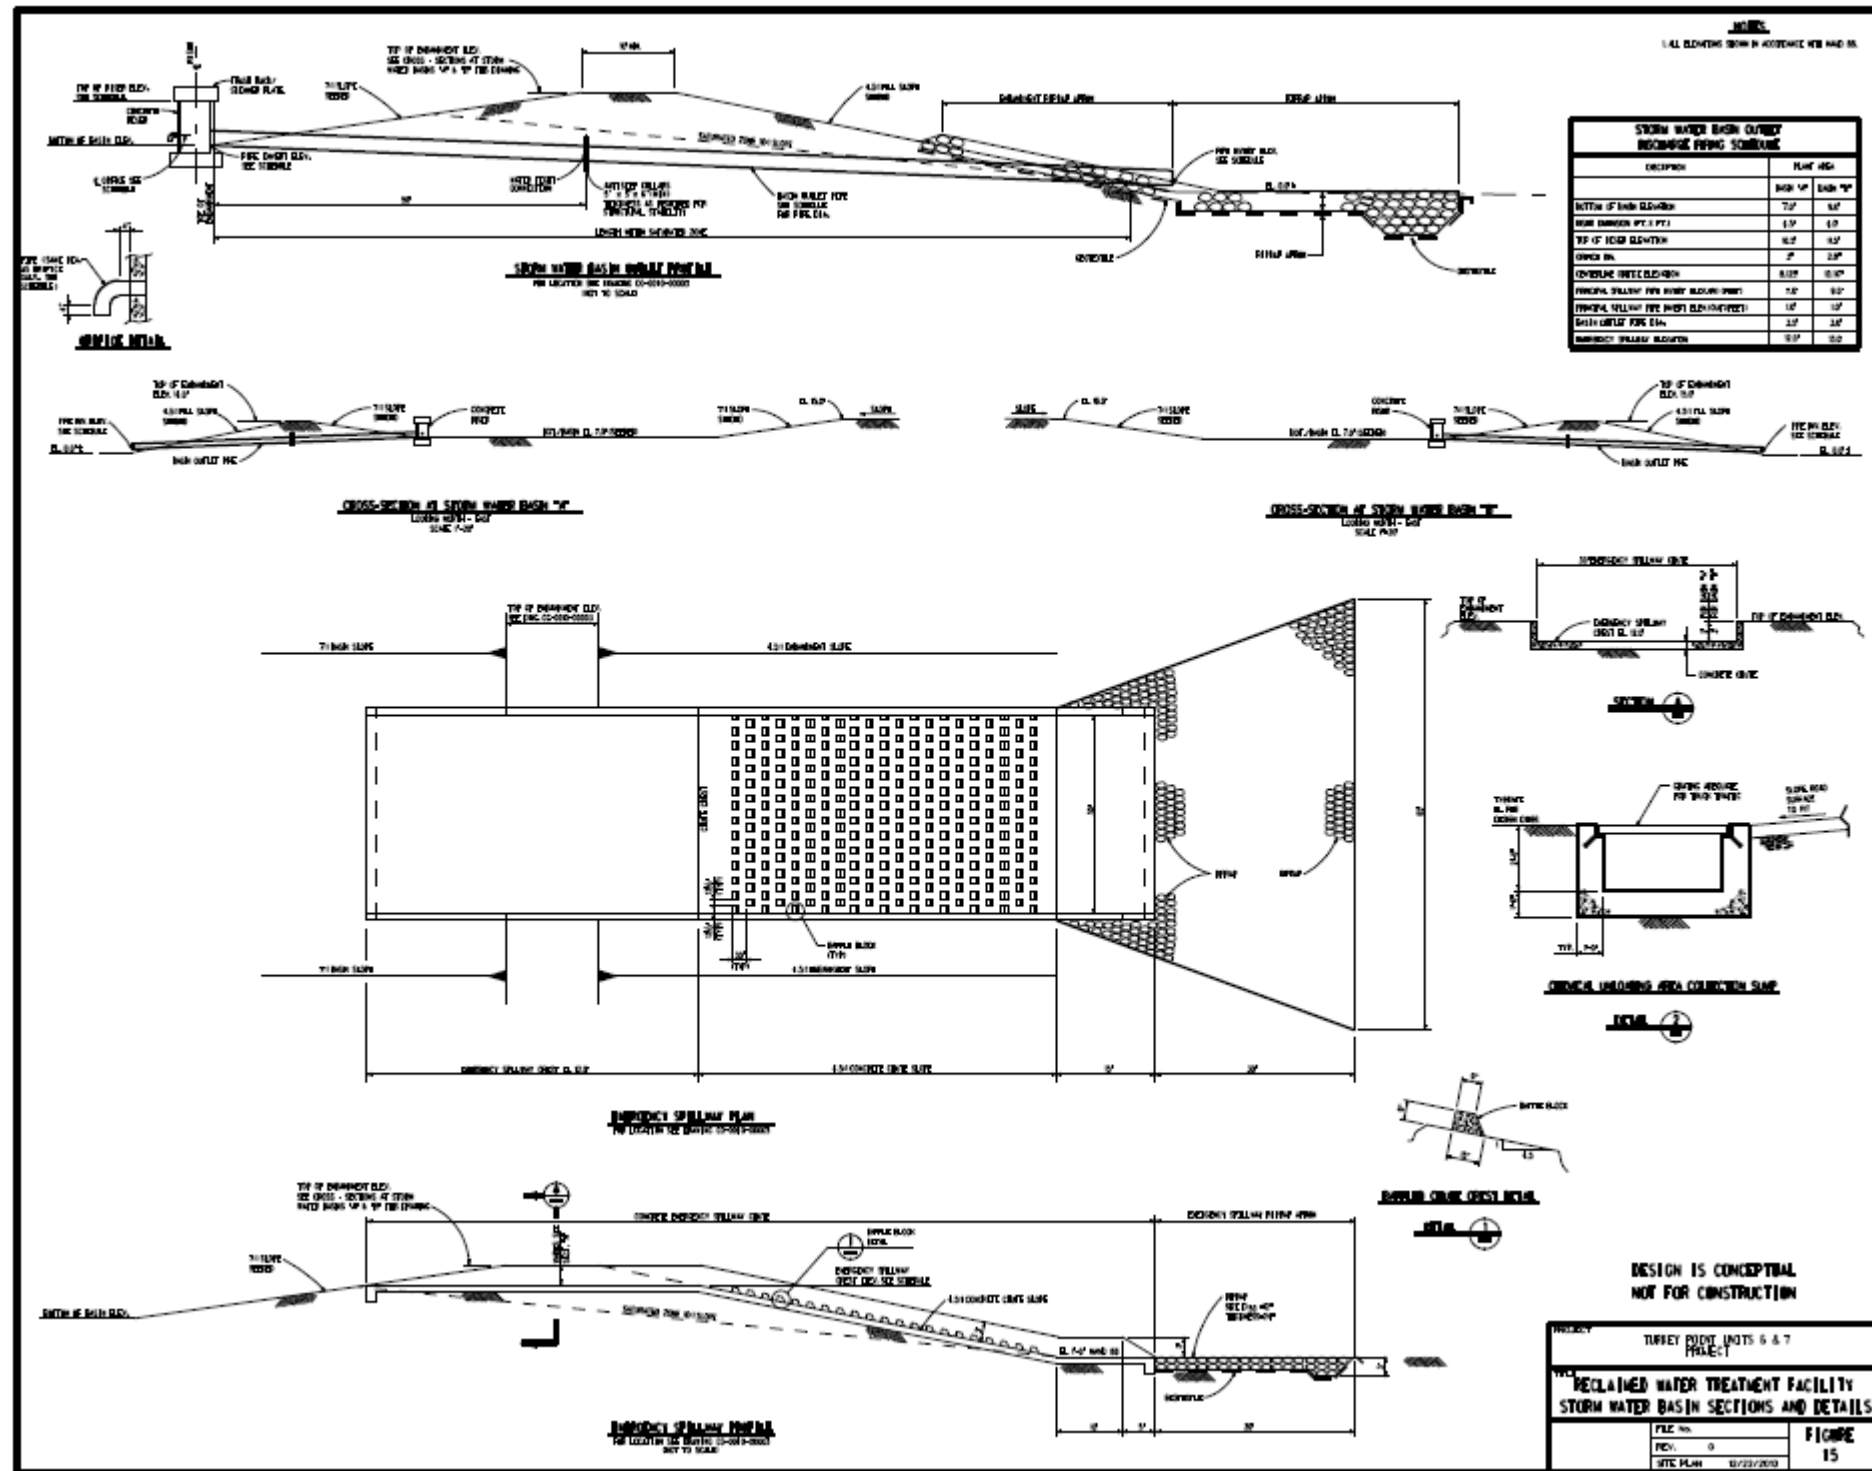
Turkey Point Unit 6 & 7 Reclaimed Water Treatment Facility Stormwater Basin Sections and Details
